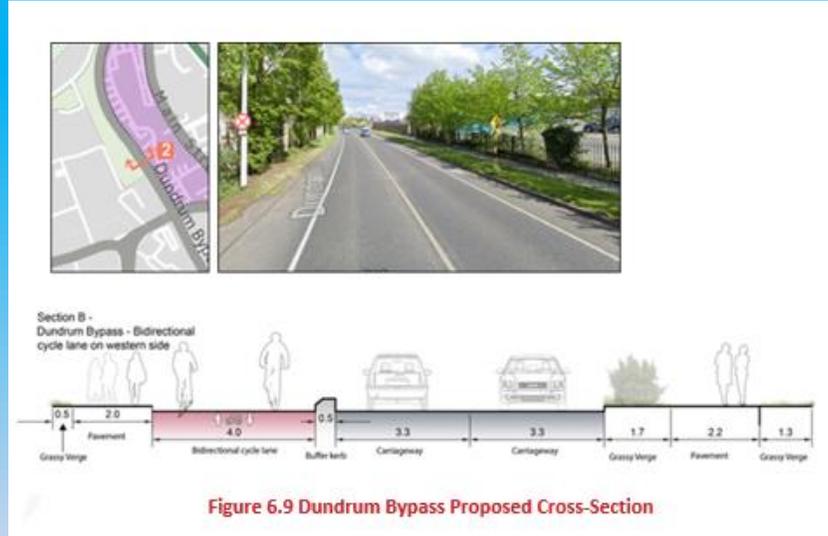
Dundrum Bypass Proposed Cross-Section
